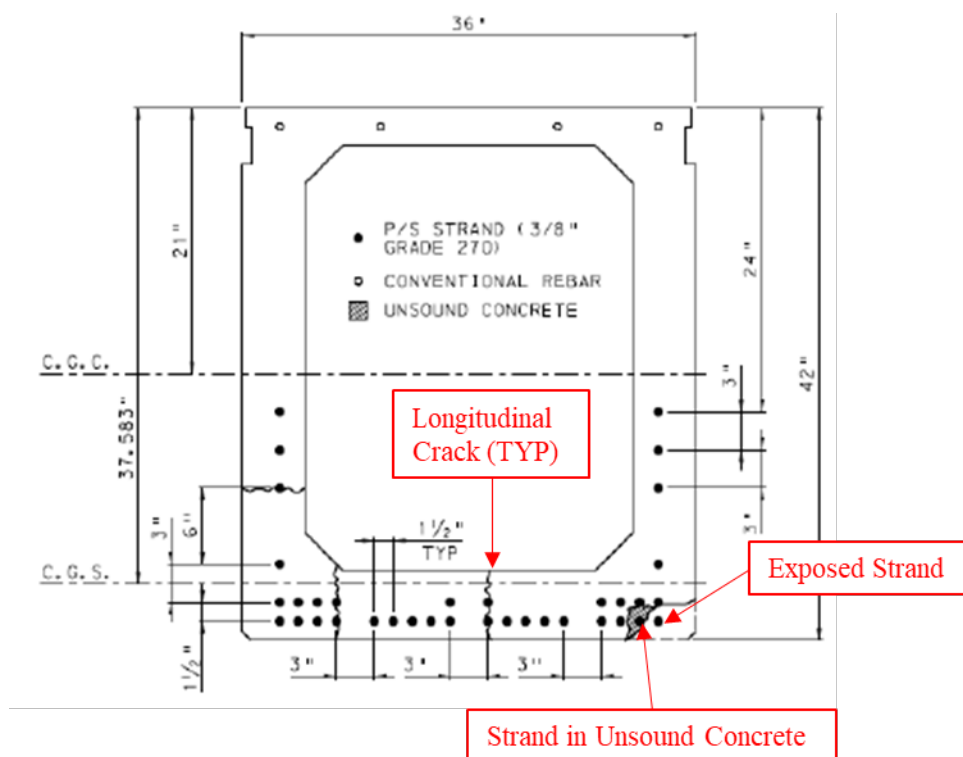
Example of a NCABB with Various Deterioration and Section Loss (Adapted from PUB 238)
